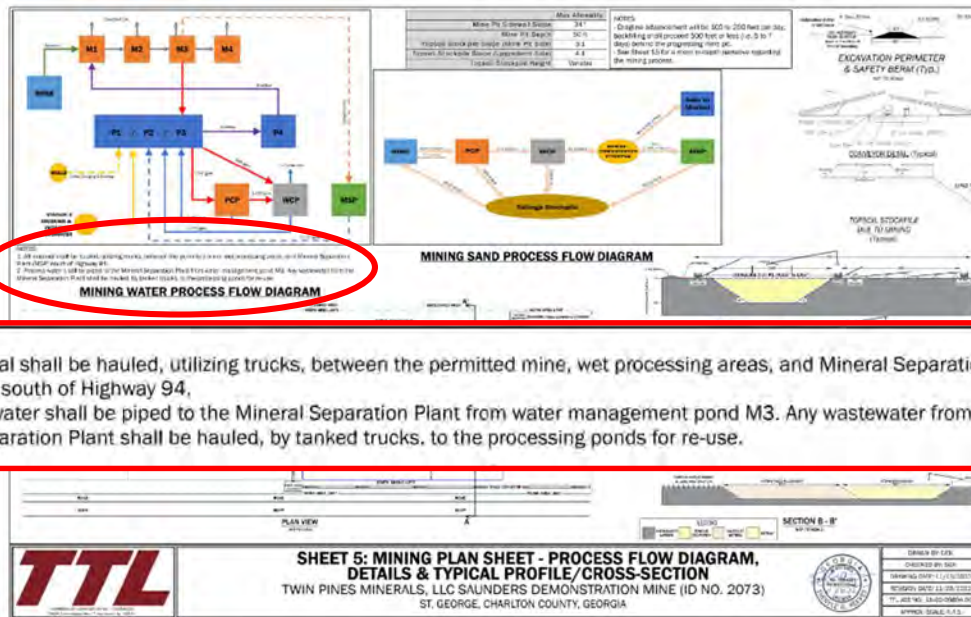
Sheet 5 of MLUP 2a stating that all material will be hauled off property to a Mineral Separation Plant and wastewater from MSP will be hauled onsite to the processing ponds to be disposed of.
